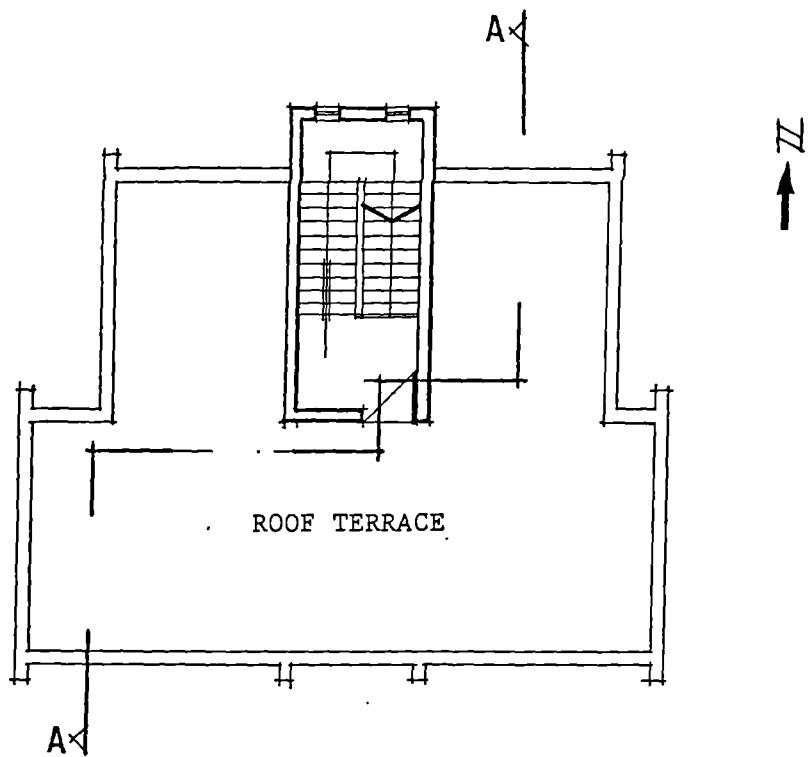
ROOF TERRACE PLAN (before modulation).
